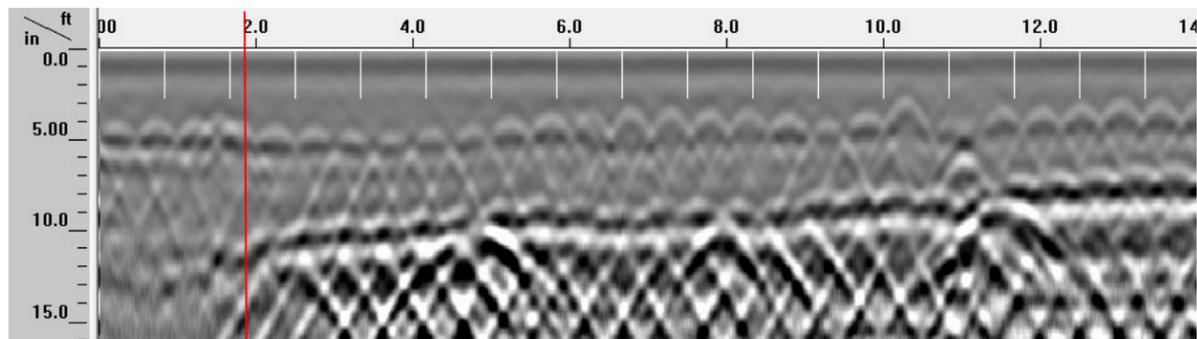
GPR profile F042.dzt collected from the underside of the ceiling of a basement space in the City Hall annex building. The image first shows the lower rebar in the structural deck and then the upper rebar in the topping slab (arches).
